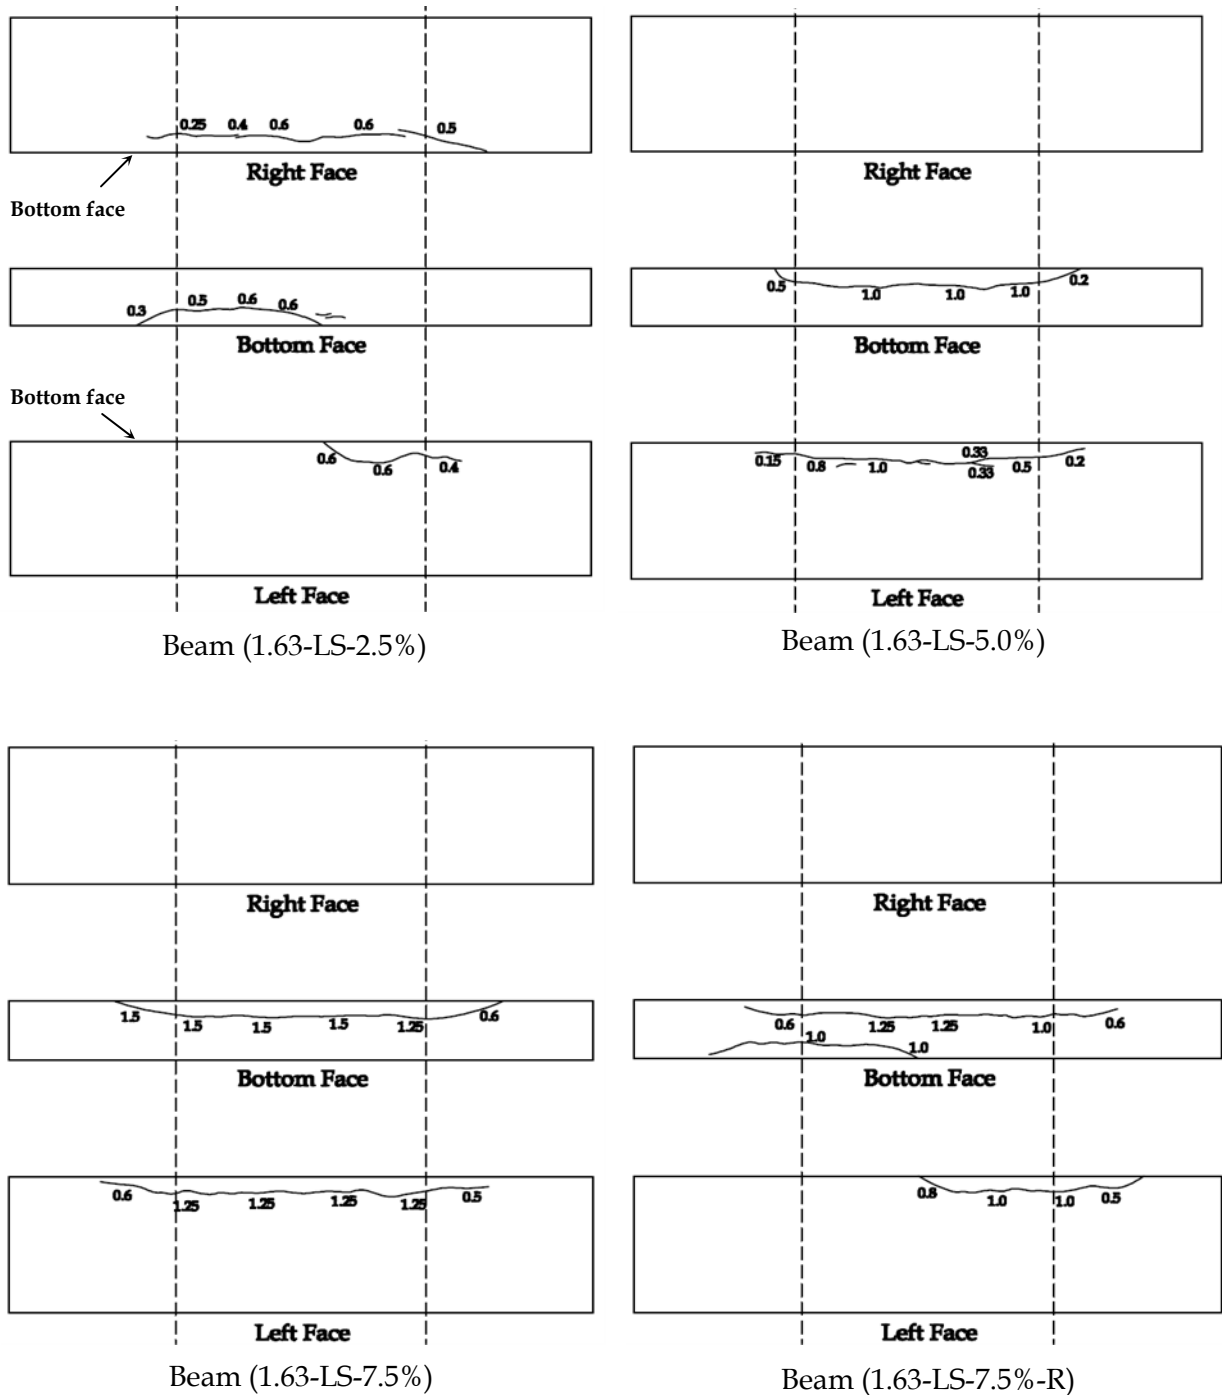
Corrosion crack patterns and crack widths of deep beams with stirrups
